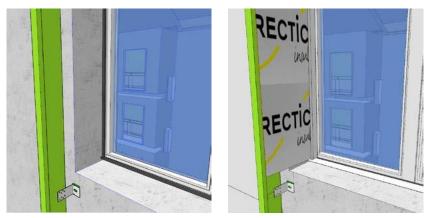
Window frame elements: rubber strip and insulation in jambs [images created using SketchUp]
